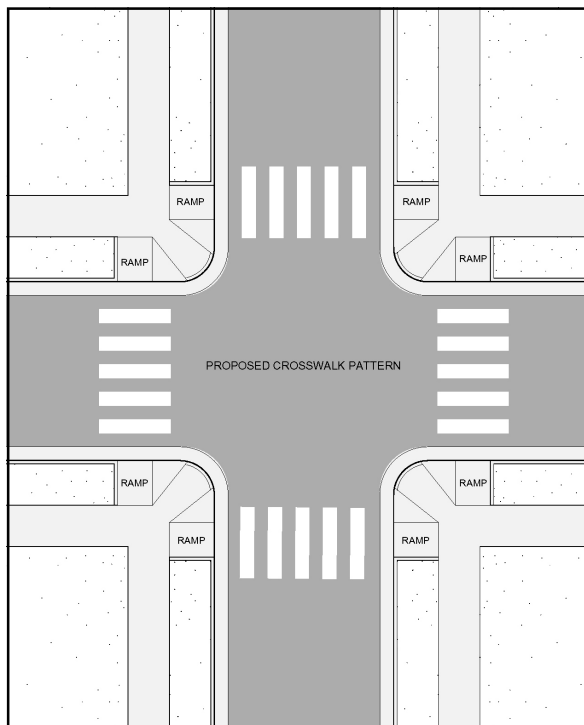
A sidewalk ramp should be constructed for each crosswalk at an intersection. This practice provides the shortest, direct route between sidewalks. It also prevents wheelchair users from having to re-align their wheel chairs while in the street in order to remain in the crosswalk. The crosswalks should be marked with zebra patterns so that they are highly visible to all roadway users.
